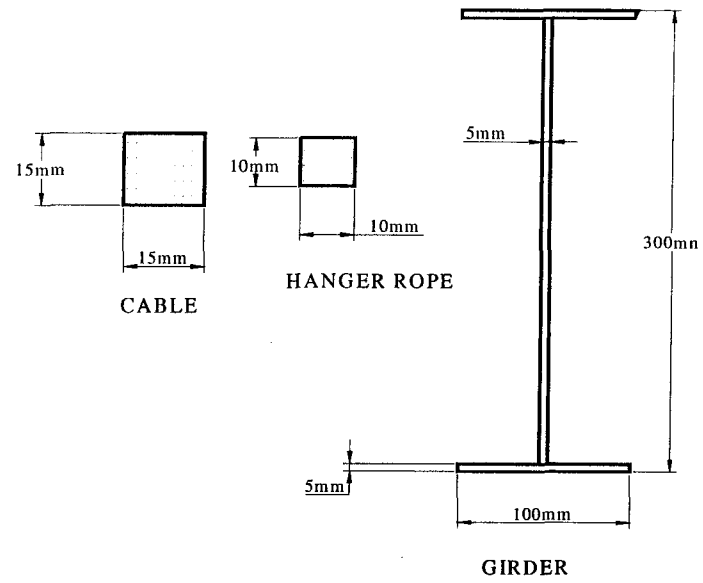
Suspended structure: (b) cross-sections: cable, hanger rope, and girder as adapted from Frangopol & Imai (2000)
